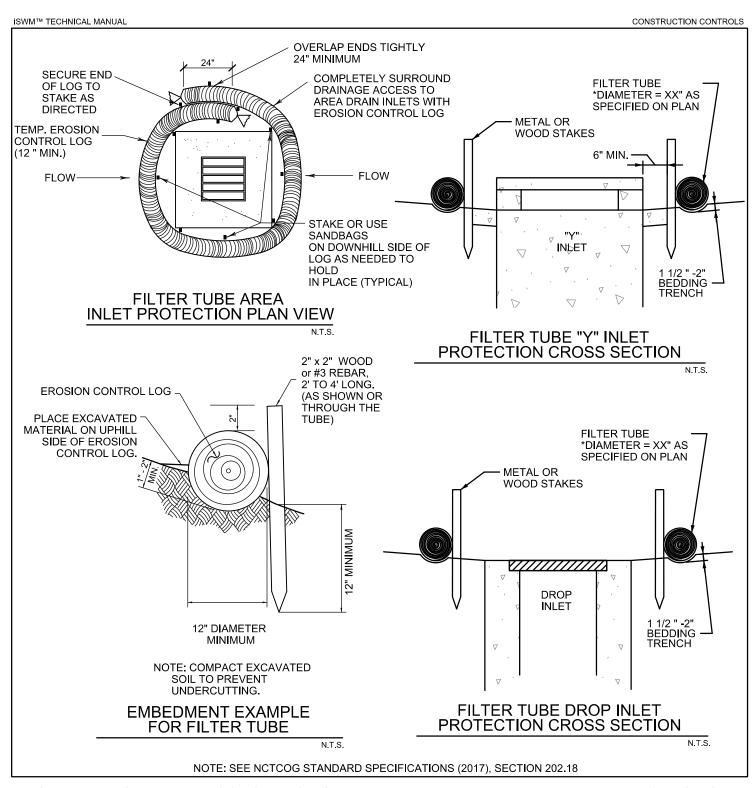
STANDARD CONSTRUCTION DETAIL - FILTER TUBE AREA INLET PROTECTION
